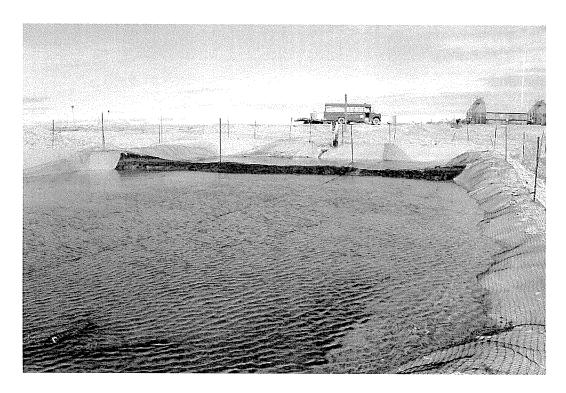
View of the West Module Train Holding Pond at PIN-3 on 8 July 2003. The photo was taken facing south. Samples 03-07255 and 03-07256 were collected from the north and south sections of the holding pond respectively.
